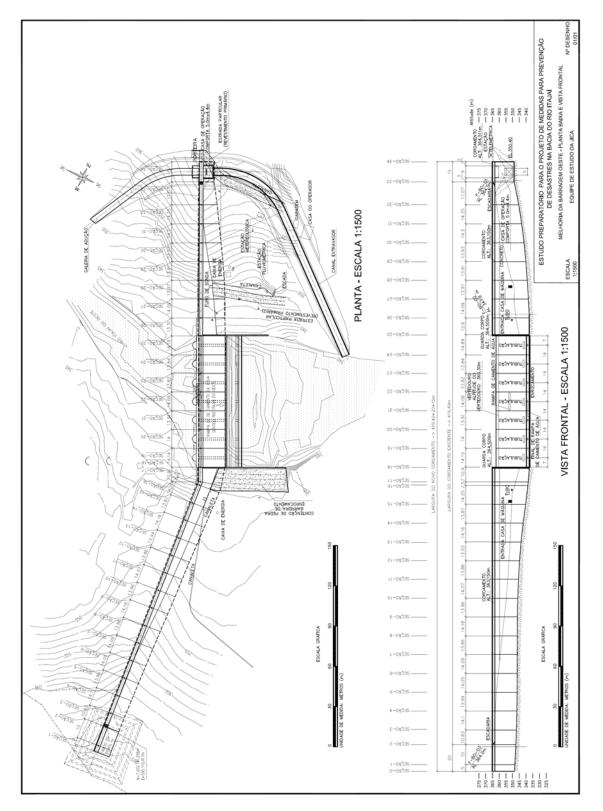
Heigtening of the Oeste Dam and Additional Conduit (1/2)
